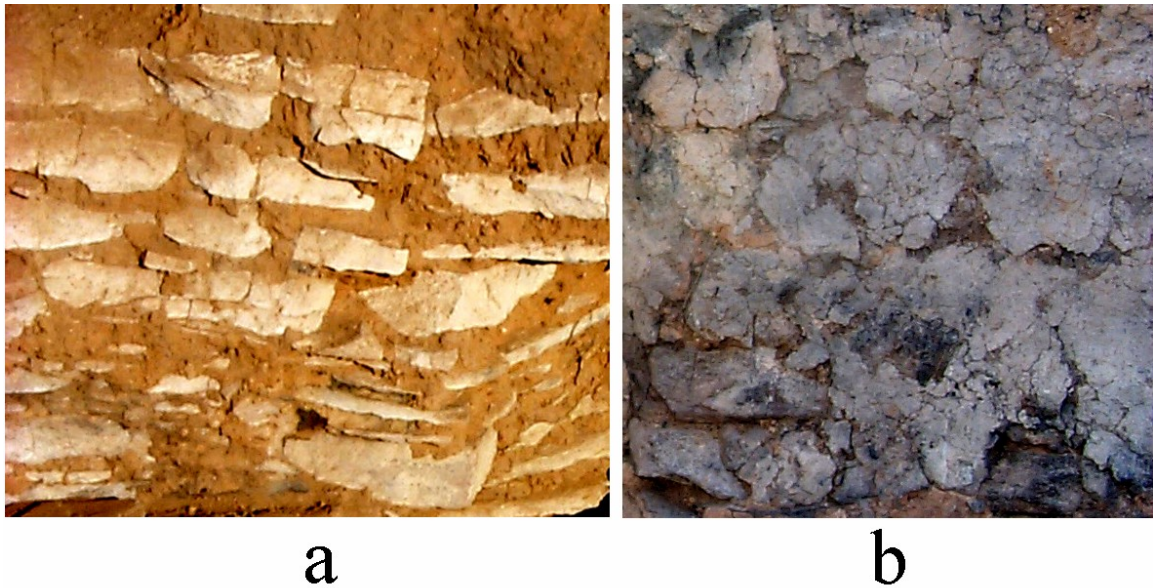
Kiva I walls: a) upper lining wall masonry; b) plastered lower lining wall.
